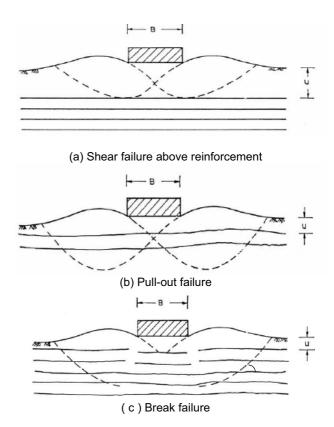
Modes of reinforced soil failure under foundation loading (After Binquet and Lee, 1975)
